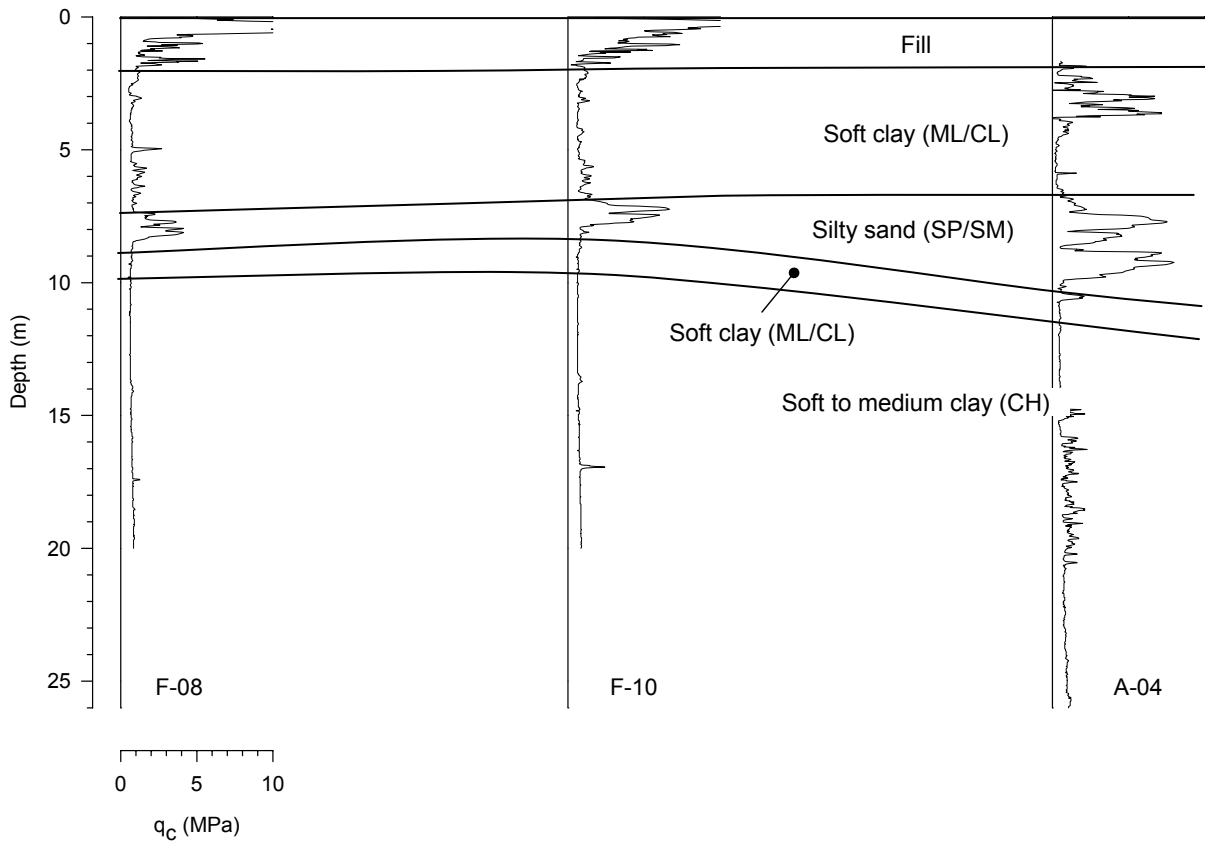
Cross section of soil layering – Lot C (section D-D)
